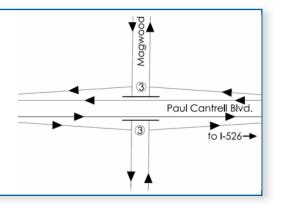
Paul Cantrell Boulevard at Magwood Drive Alternative 4
